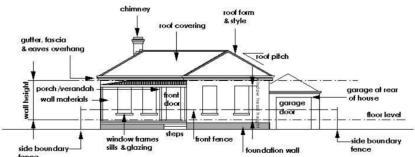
STREETSCAPE ELEMENTS IN ELEVATION
